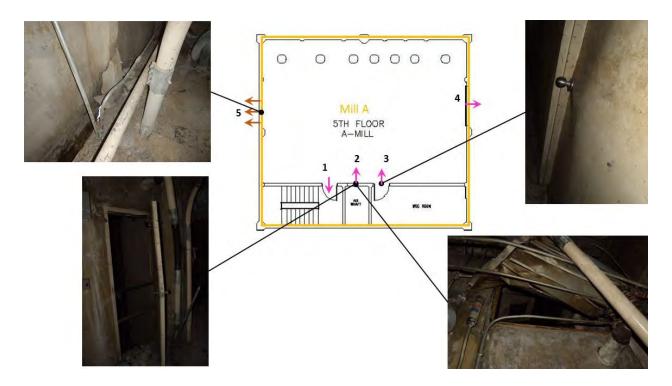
Mill A Level 5 Exemplar Directional Indicators
